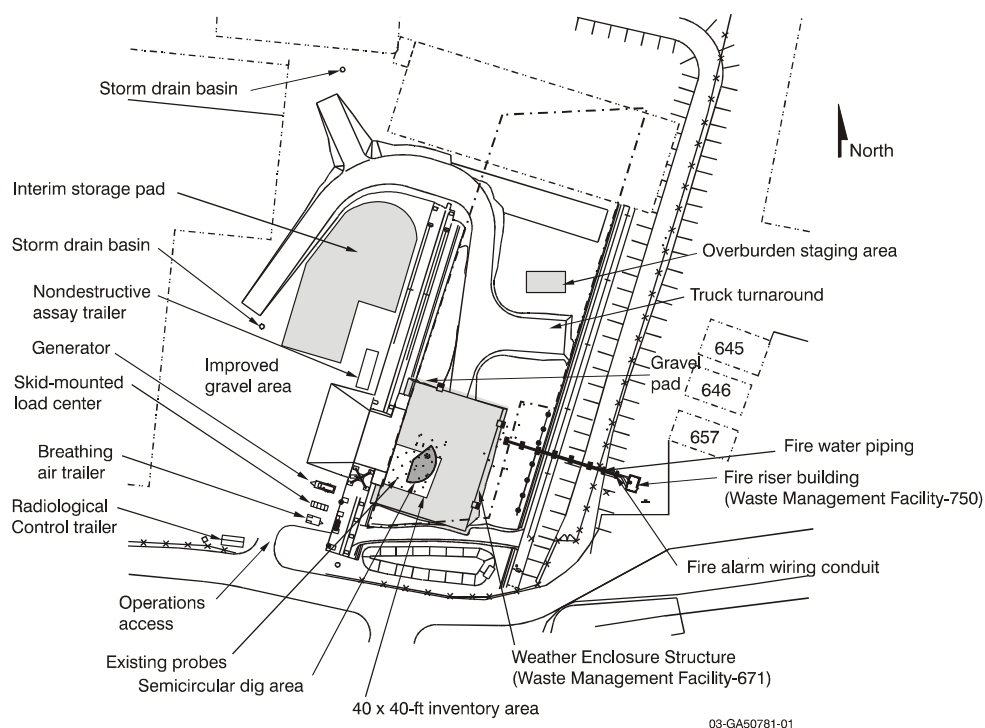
Site plan of the OU 7-10 the Glovebox Excavator Method Project.
